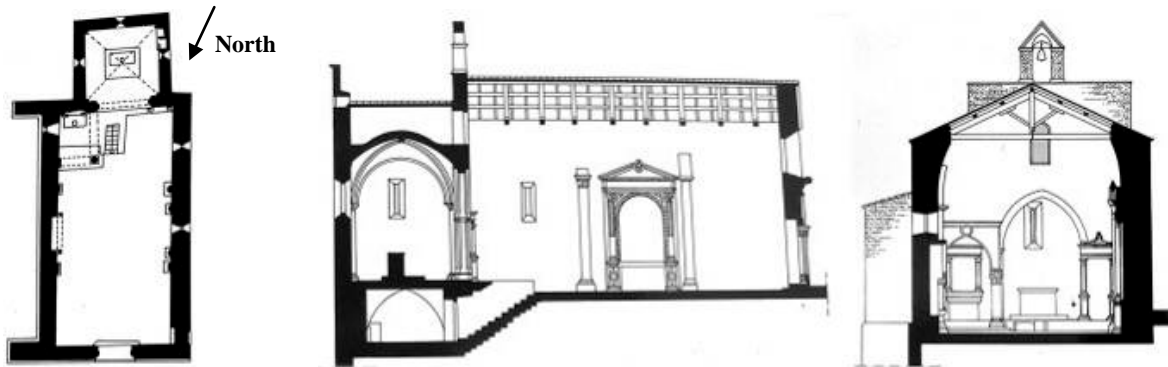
Plan and cross section views of the Church of Santa Maria ad Cryptas.
